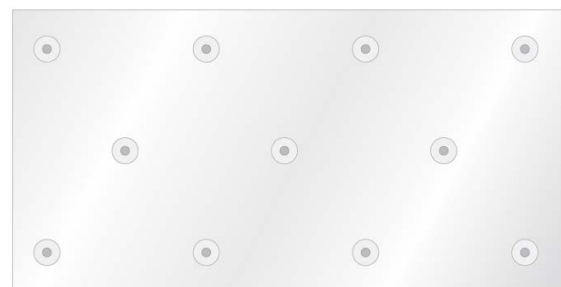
Fastener pattern - 11 fasteners per boards for boards 2400mm x 1200mm (3.81 fixings / m²).
